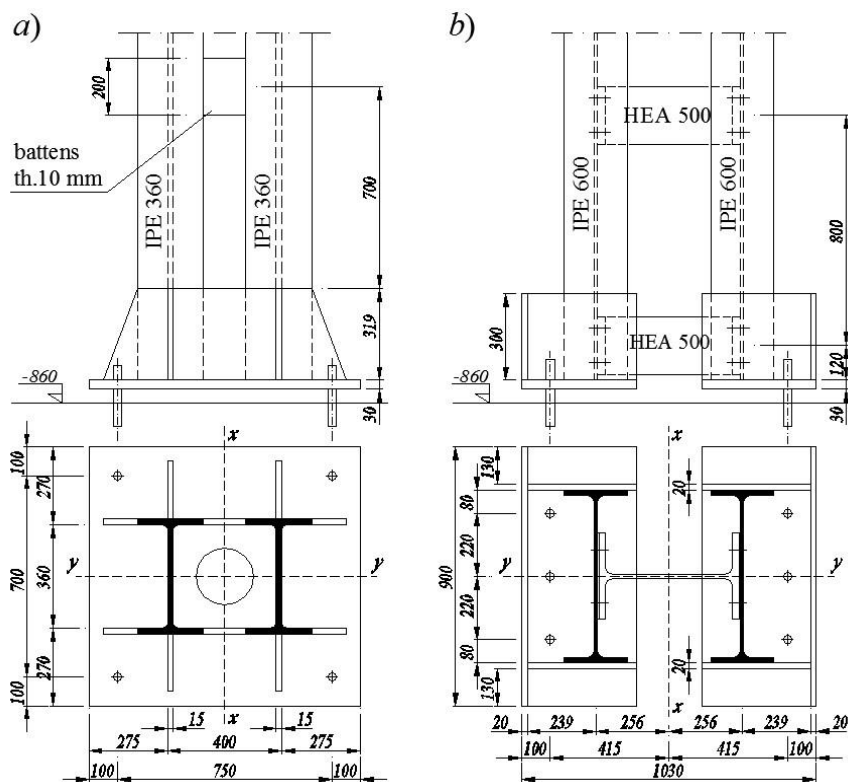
Columns and base connections: (a) type A column, (b) type B column.
